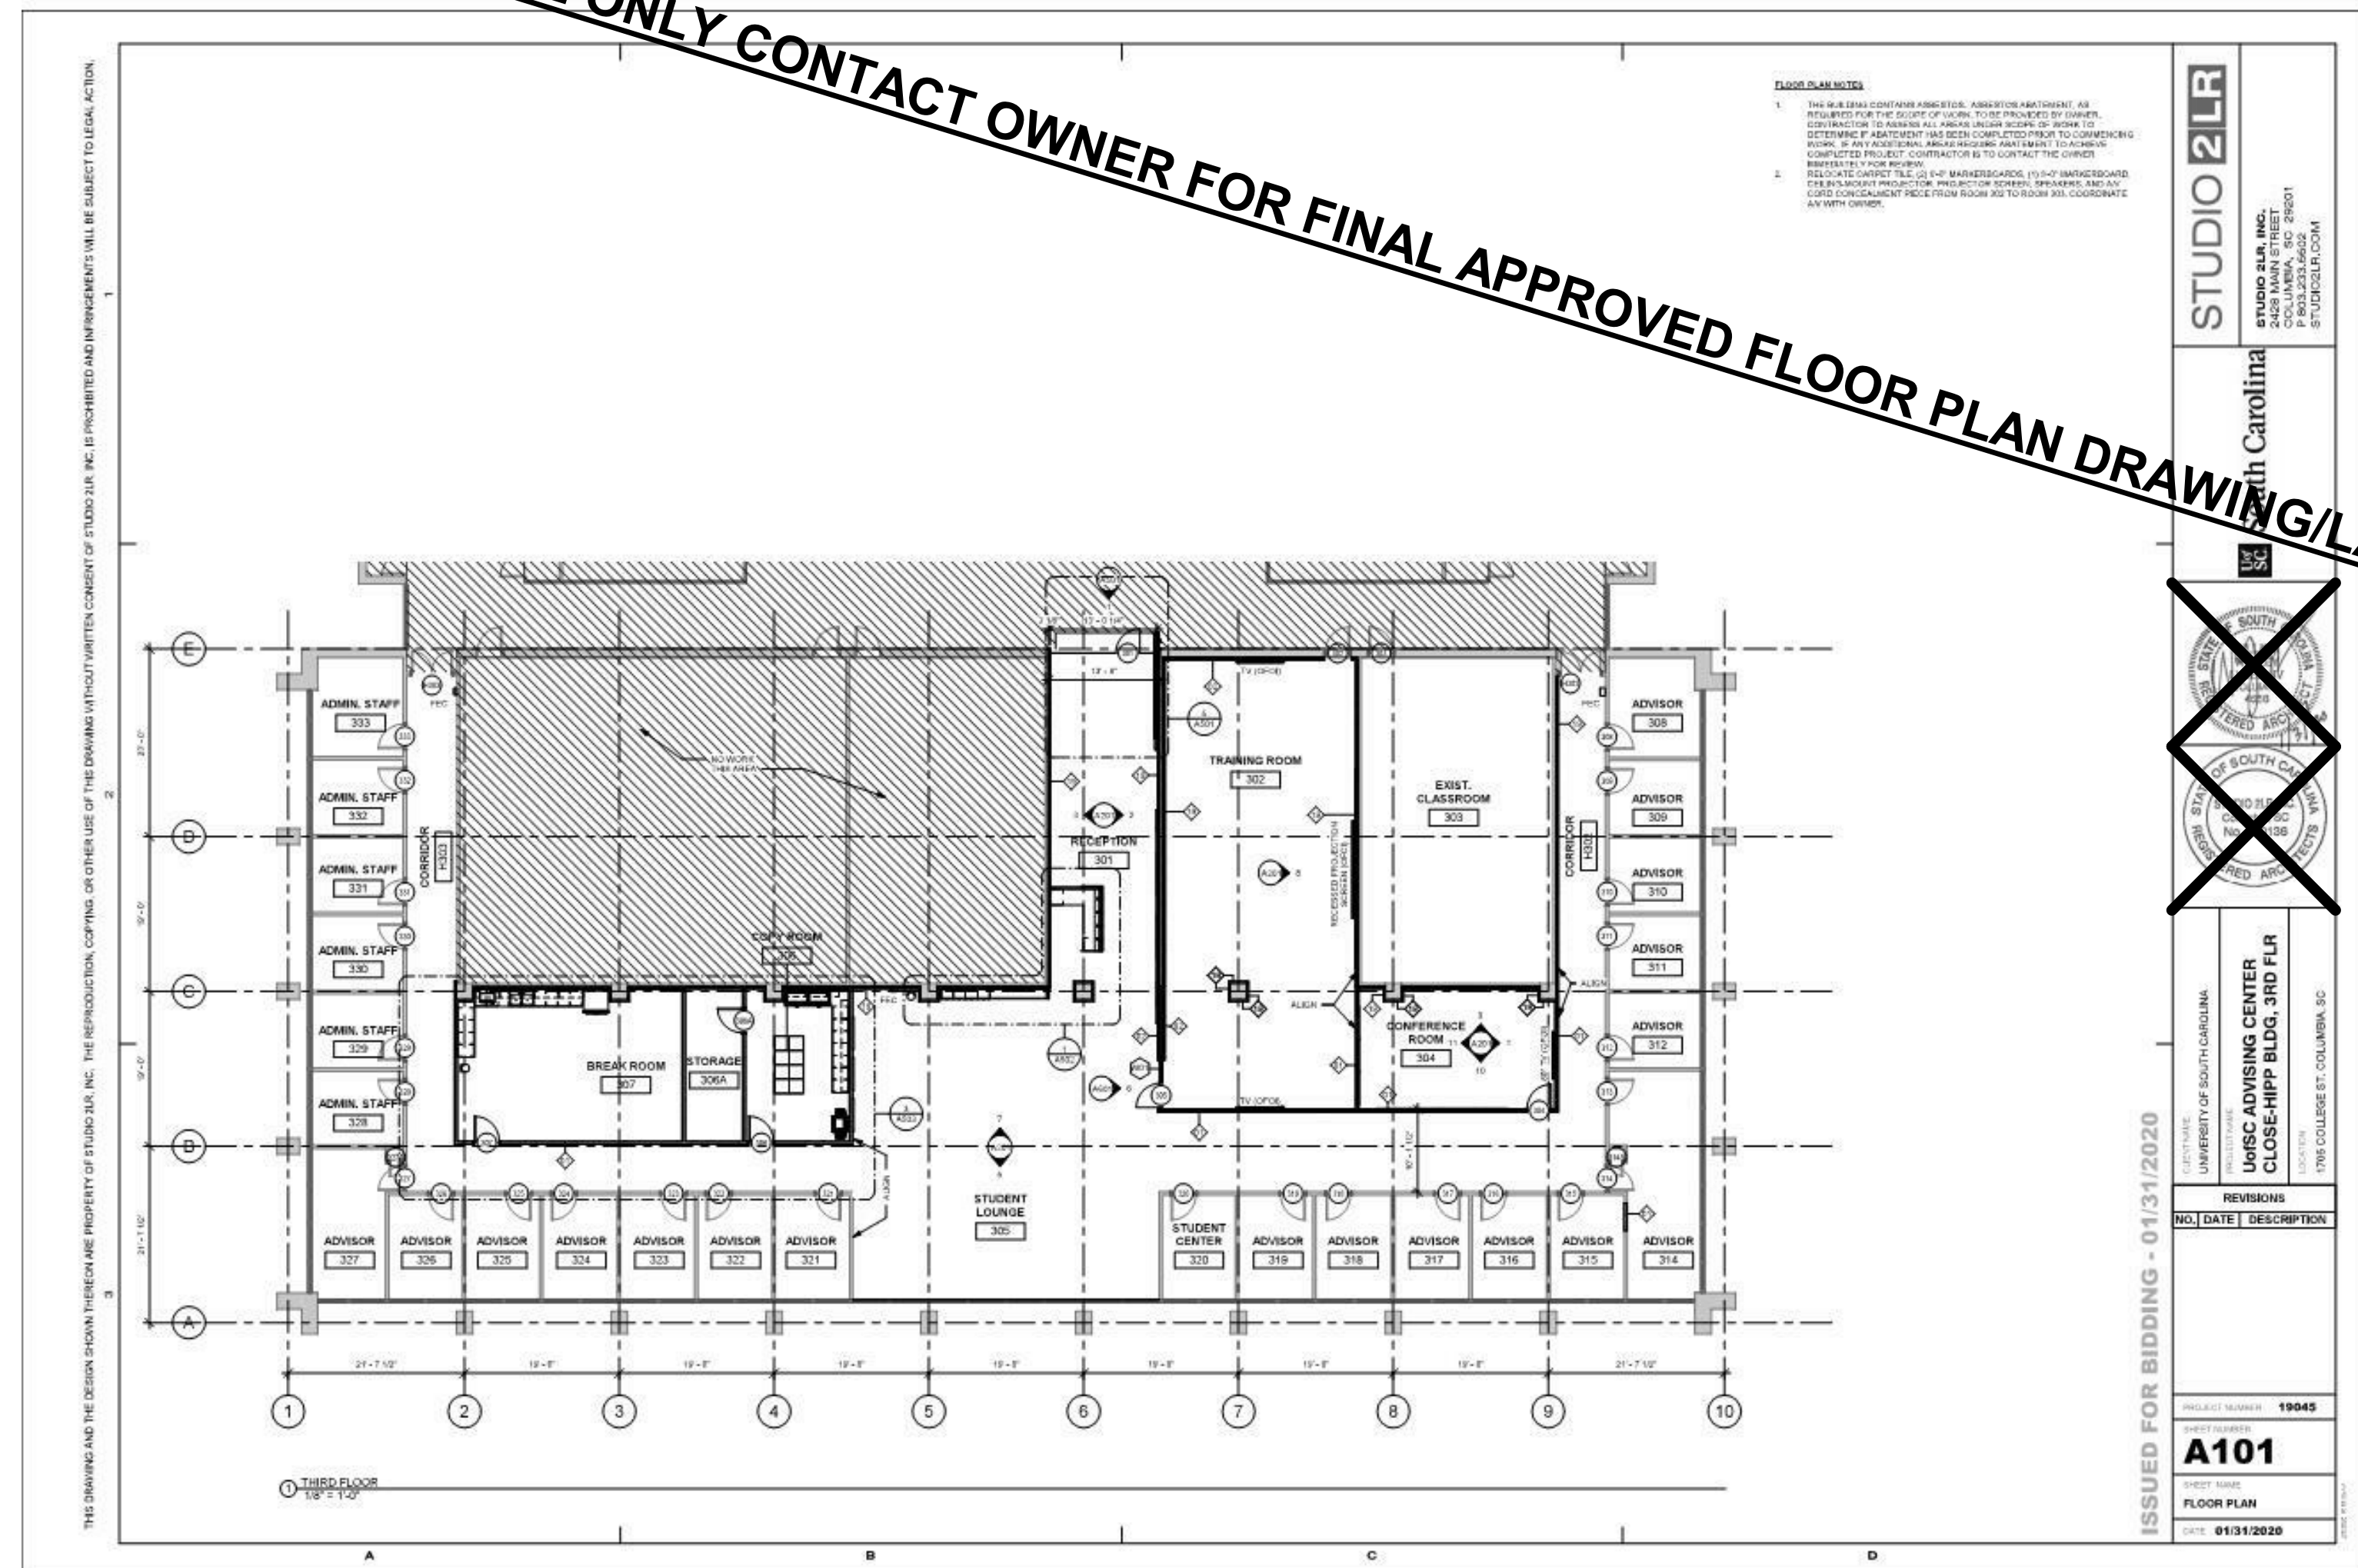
FOR REFERENCE ONLY CONTACT OWNER FOR FINAL APPROVED FLOOR PLAN DRAWING/LAYOUT.
